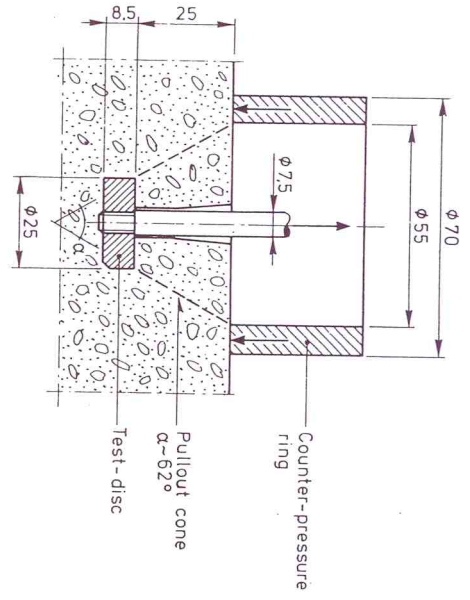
Test set-up for the so-called LOK-TEST pullout system. (Dimensions in mm).
